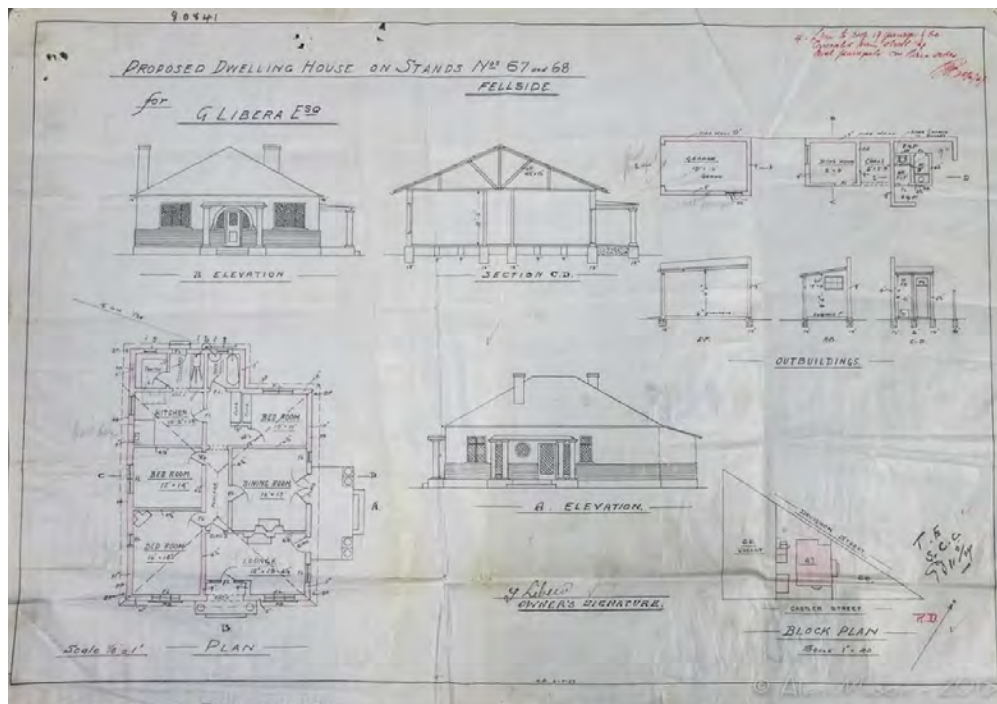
Plan for proposed dwelling house on Stand 67 & 68
